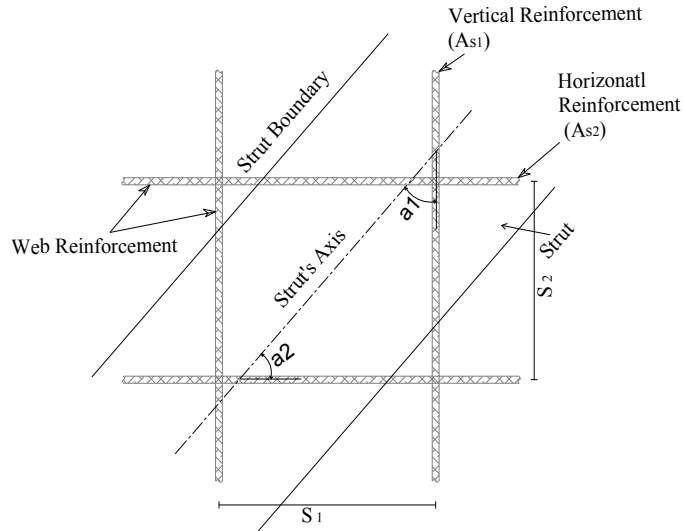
Reinforcement crossing a strut. ACI 318-08 [2008]
